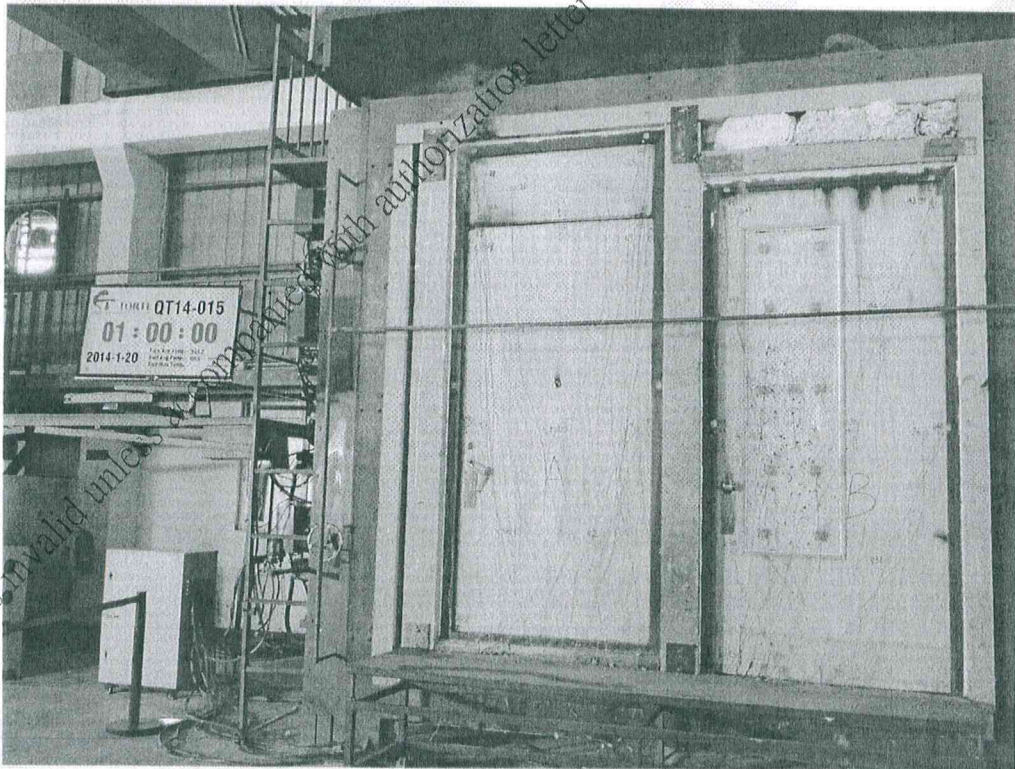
Unexposed surface of the specimens at 60 minute of test.
